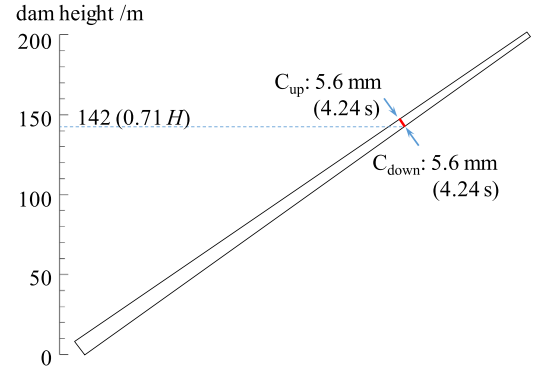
Crack location, maximum crack width, and initial cracking moment for the reinforced concrete face slab during the earthquake.
